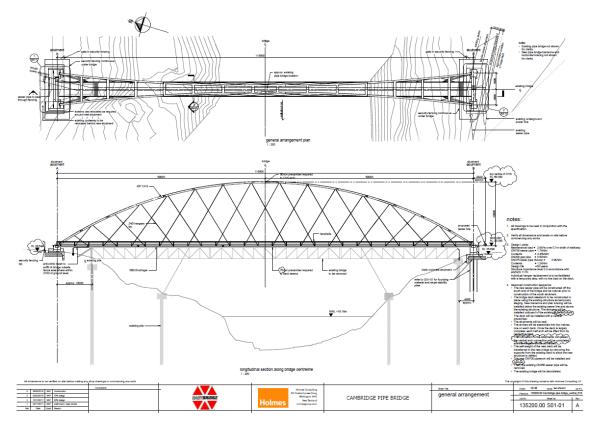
General Arrangement of the New Network Arch Bridge (IFC Drawing Set)
